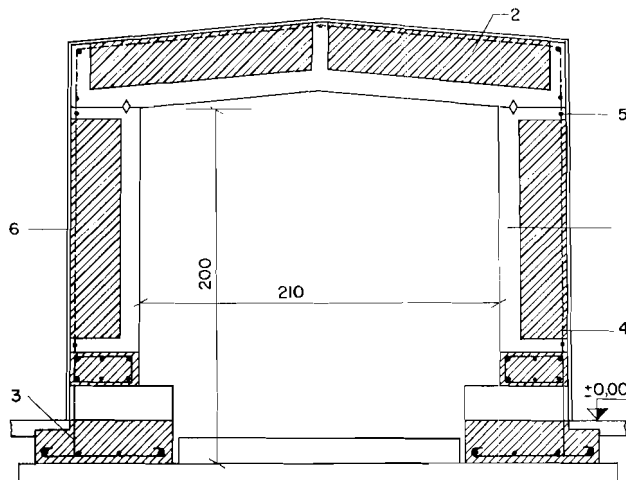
Cross section of diatomite brick kiln. Temperature of burning equal to 1000 °C. Constructed of prefabricated fireproof reinforced concrete members.
